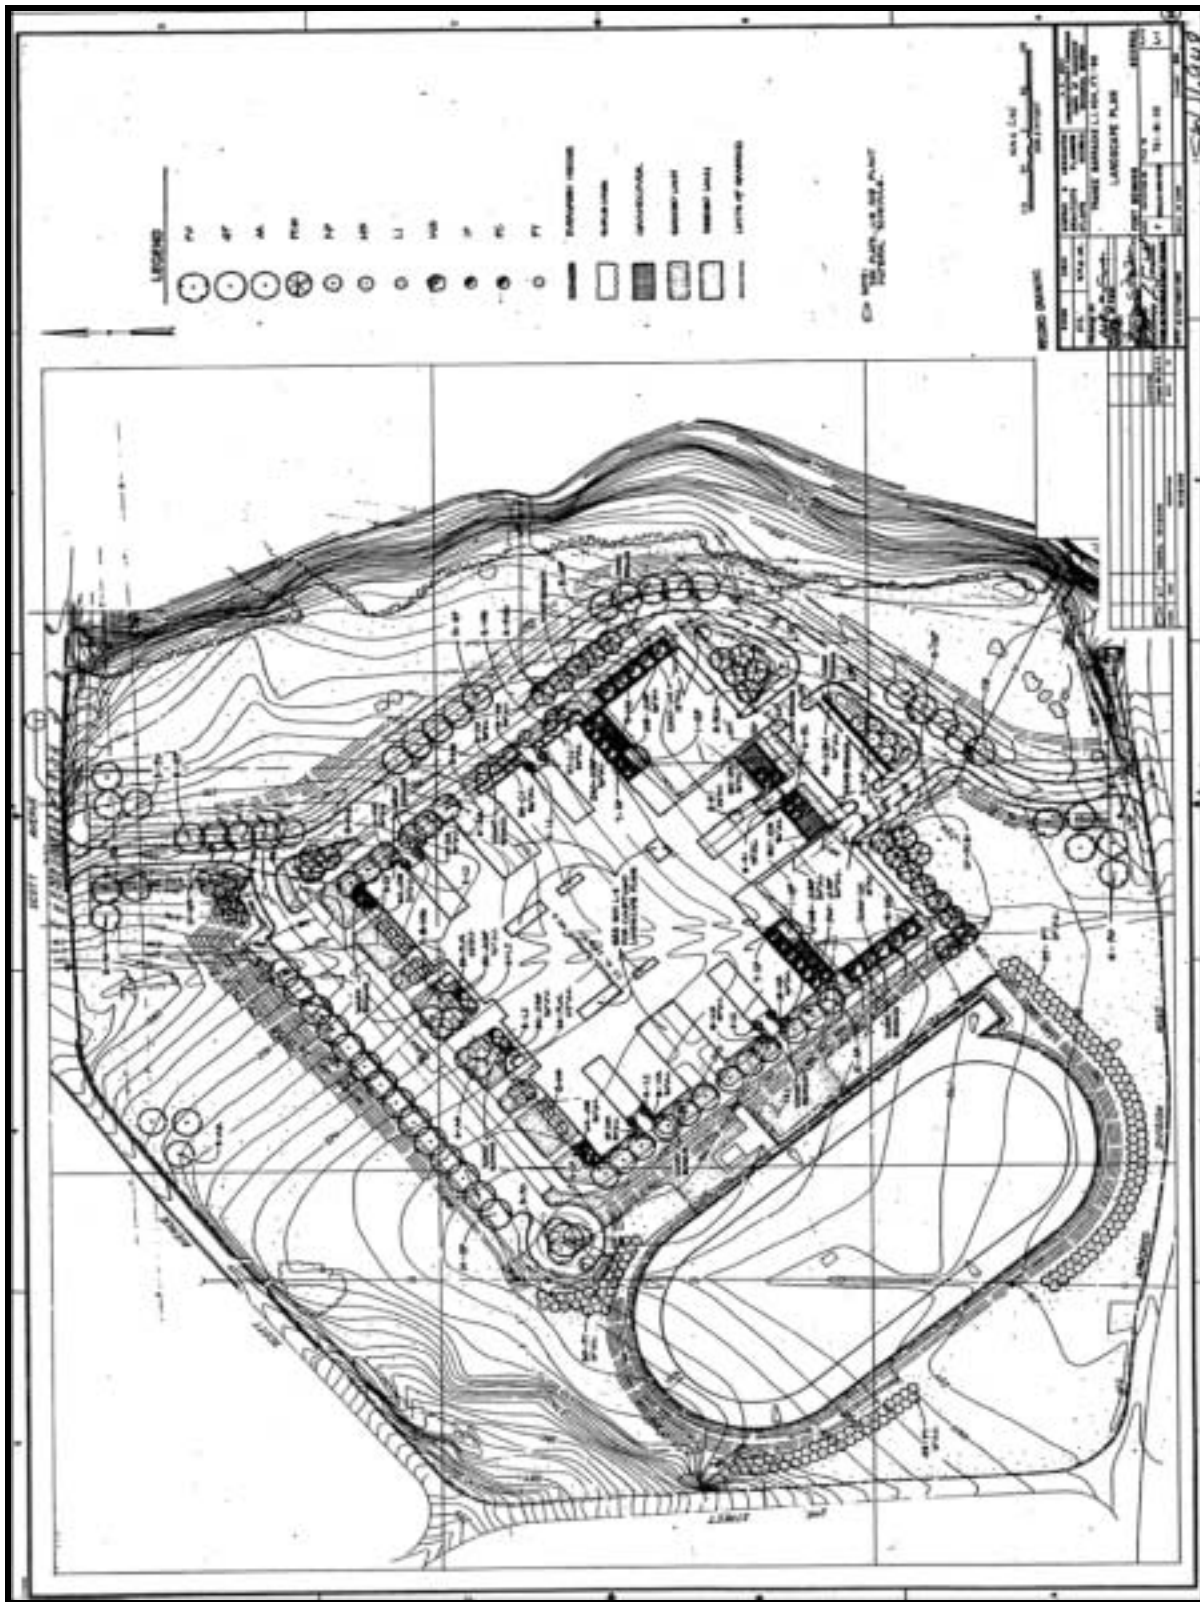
Starship barracks, landscaping plan (1985, revised 1986) (Engineering, Ft. Benning).
